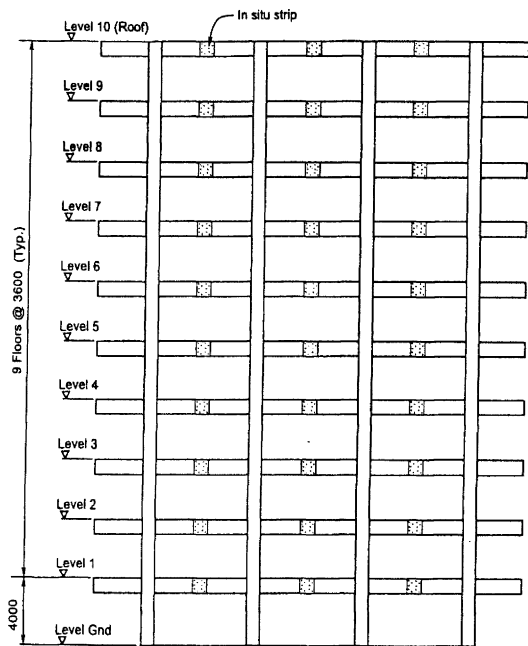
Perimeter Frame Elevation (CCANZ 1998).
